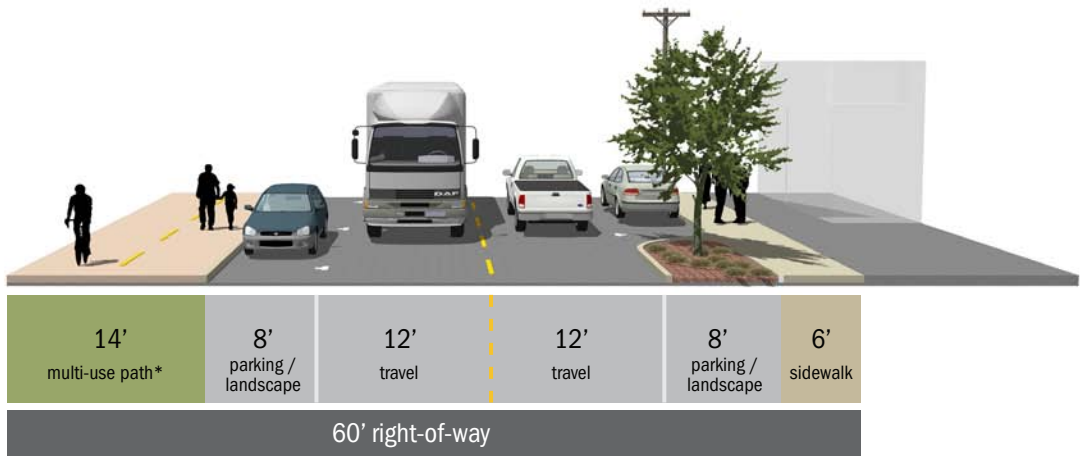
Proposed Conceptual Cross-Section for Mailwell Drive
